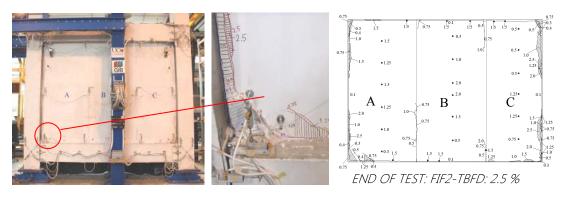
Damage state of timber framed drywall FIF2-TBFD at the end of test
